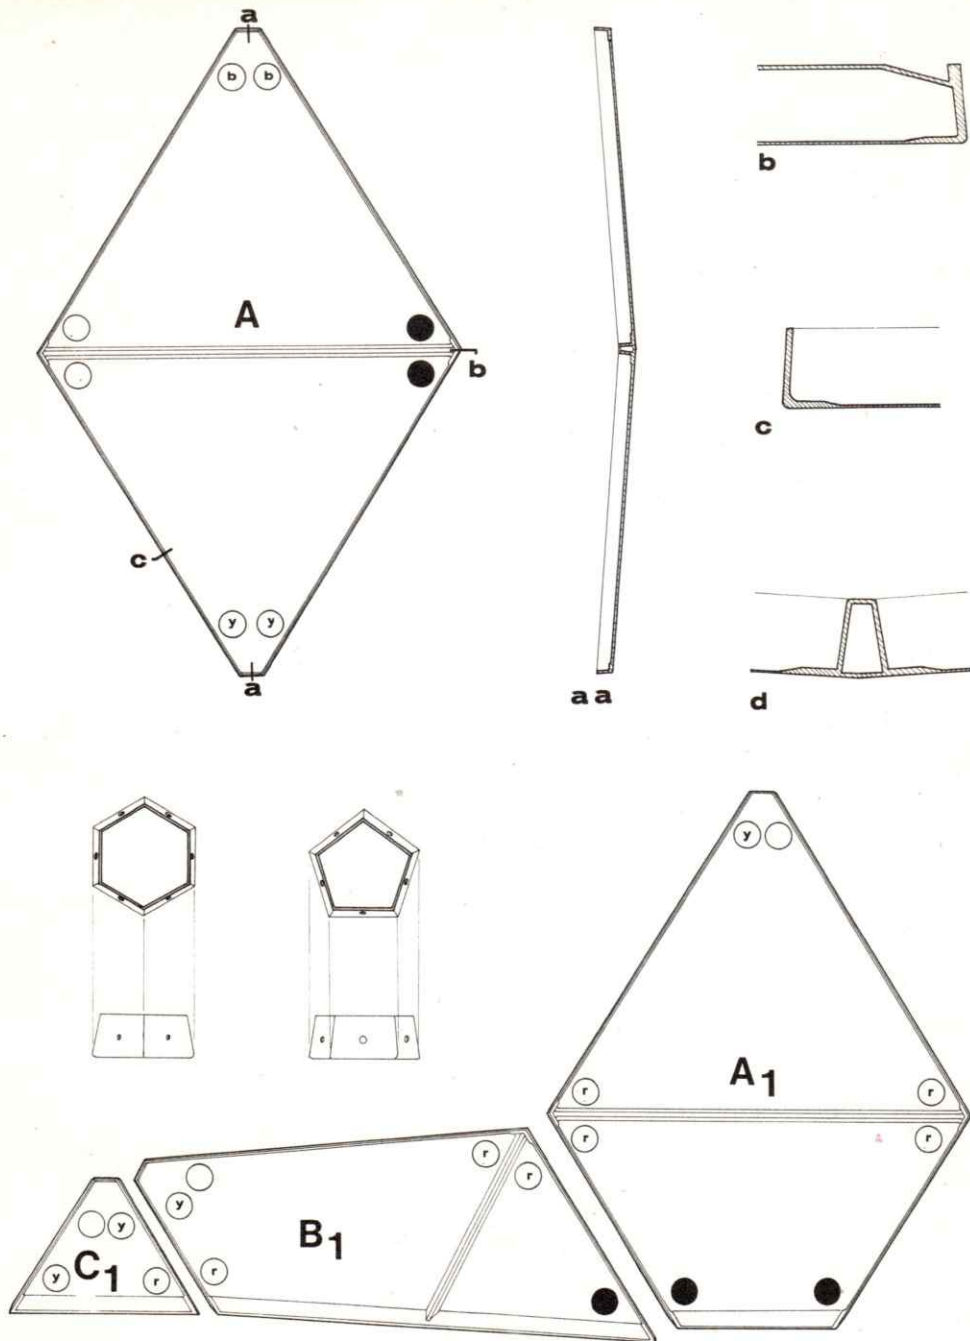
Typical polyester fiberglass panels. Structural "rails" are formed when two adjacent panels are joined by fasteners. A built up section such as "d" is achieved by placing a foam plastic piece on the panel and glassing over it with cloth and resen, the foam strip is merely a form. Vertex hubs are usually cast assemblies. Again color codes are indicated.
